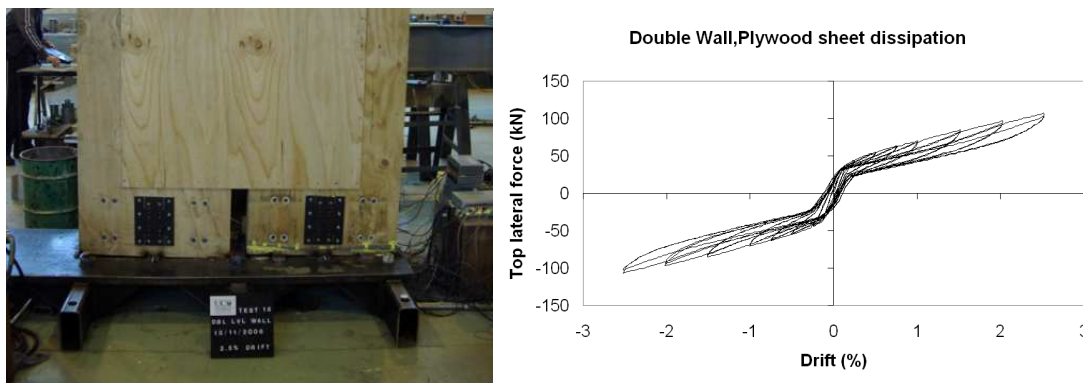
Wall testing coupled with nailed plywood (Smith et al. 2007)
